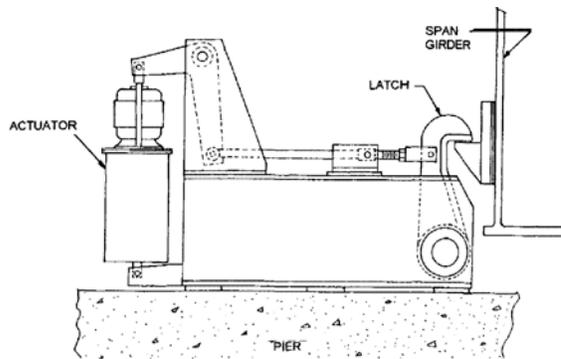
A latch type lock used on vertical-lift bridges
